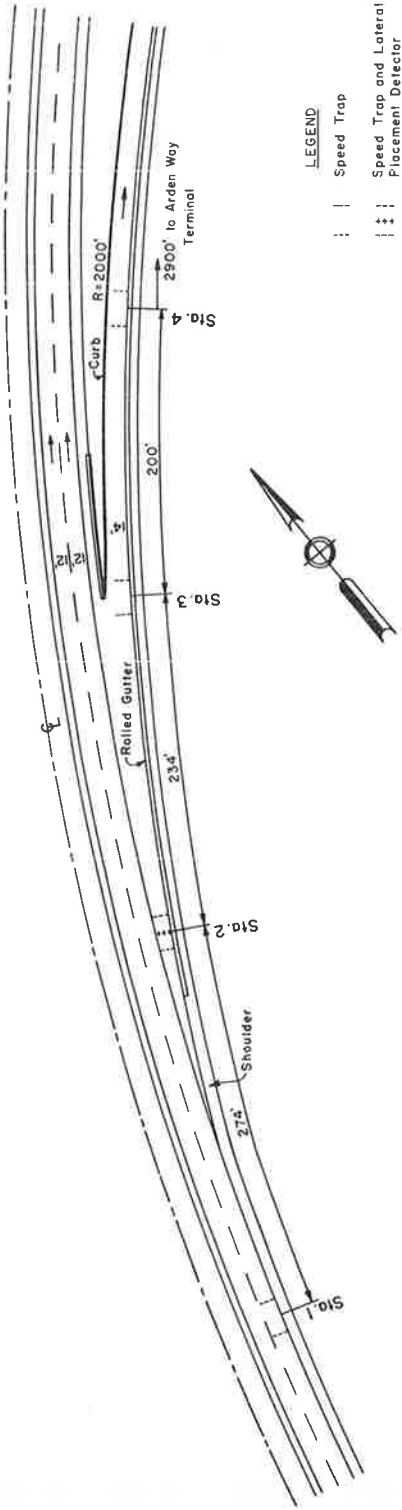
Study site 8L, northbound exit ramp to Arden Way, Elvas Freeway, North Sacramento, Calif.
